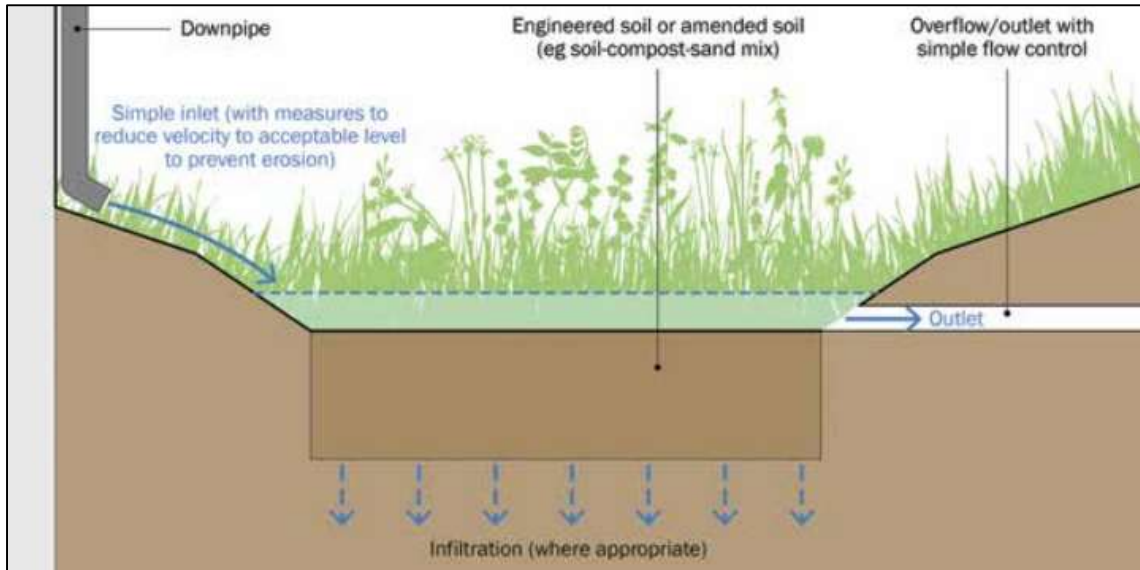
Raingarden Cross Section from Figure 18.2 of CIRIA SuDS Manual C753
